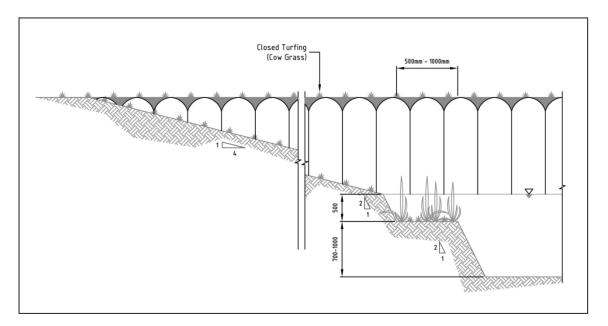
Example of Proposed Shallow Vegetated Benches at Pond
